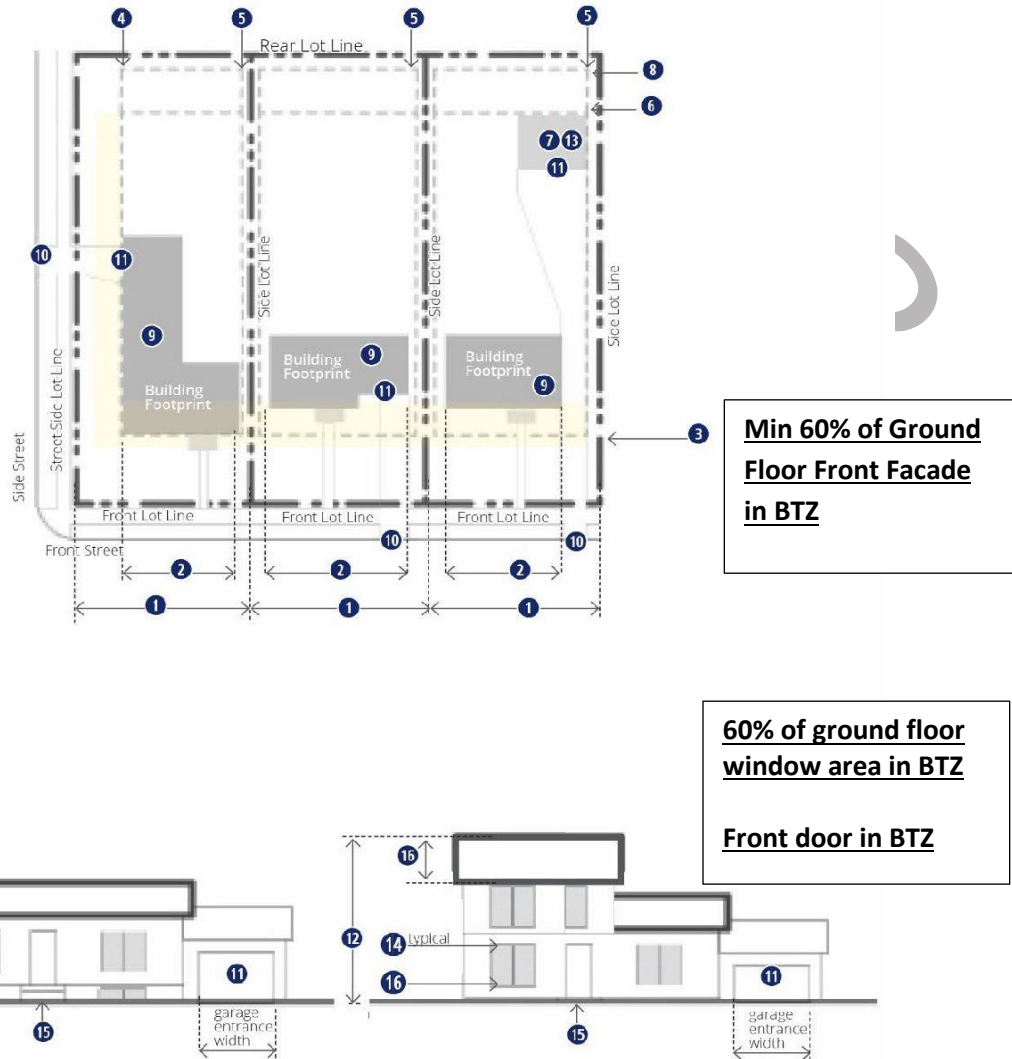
(2). N2 district diagrammatic plans and elevations.
